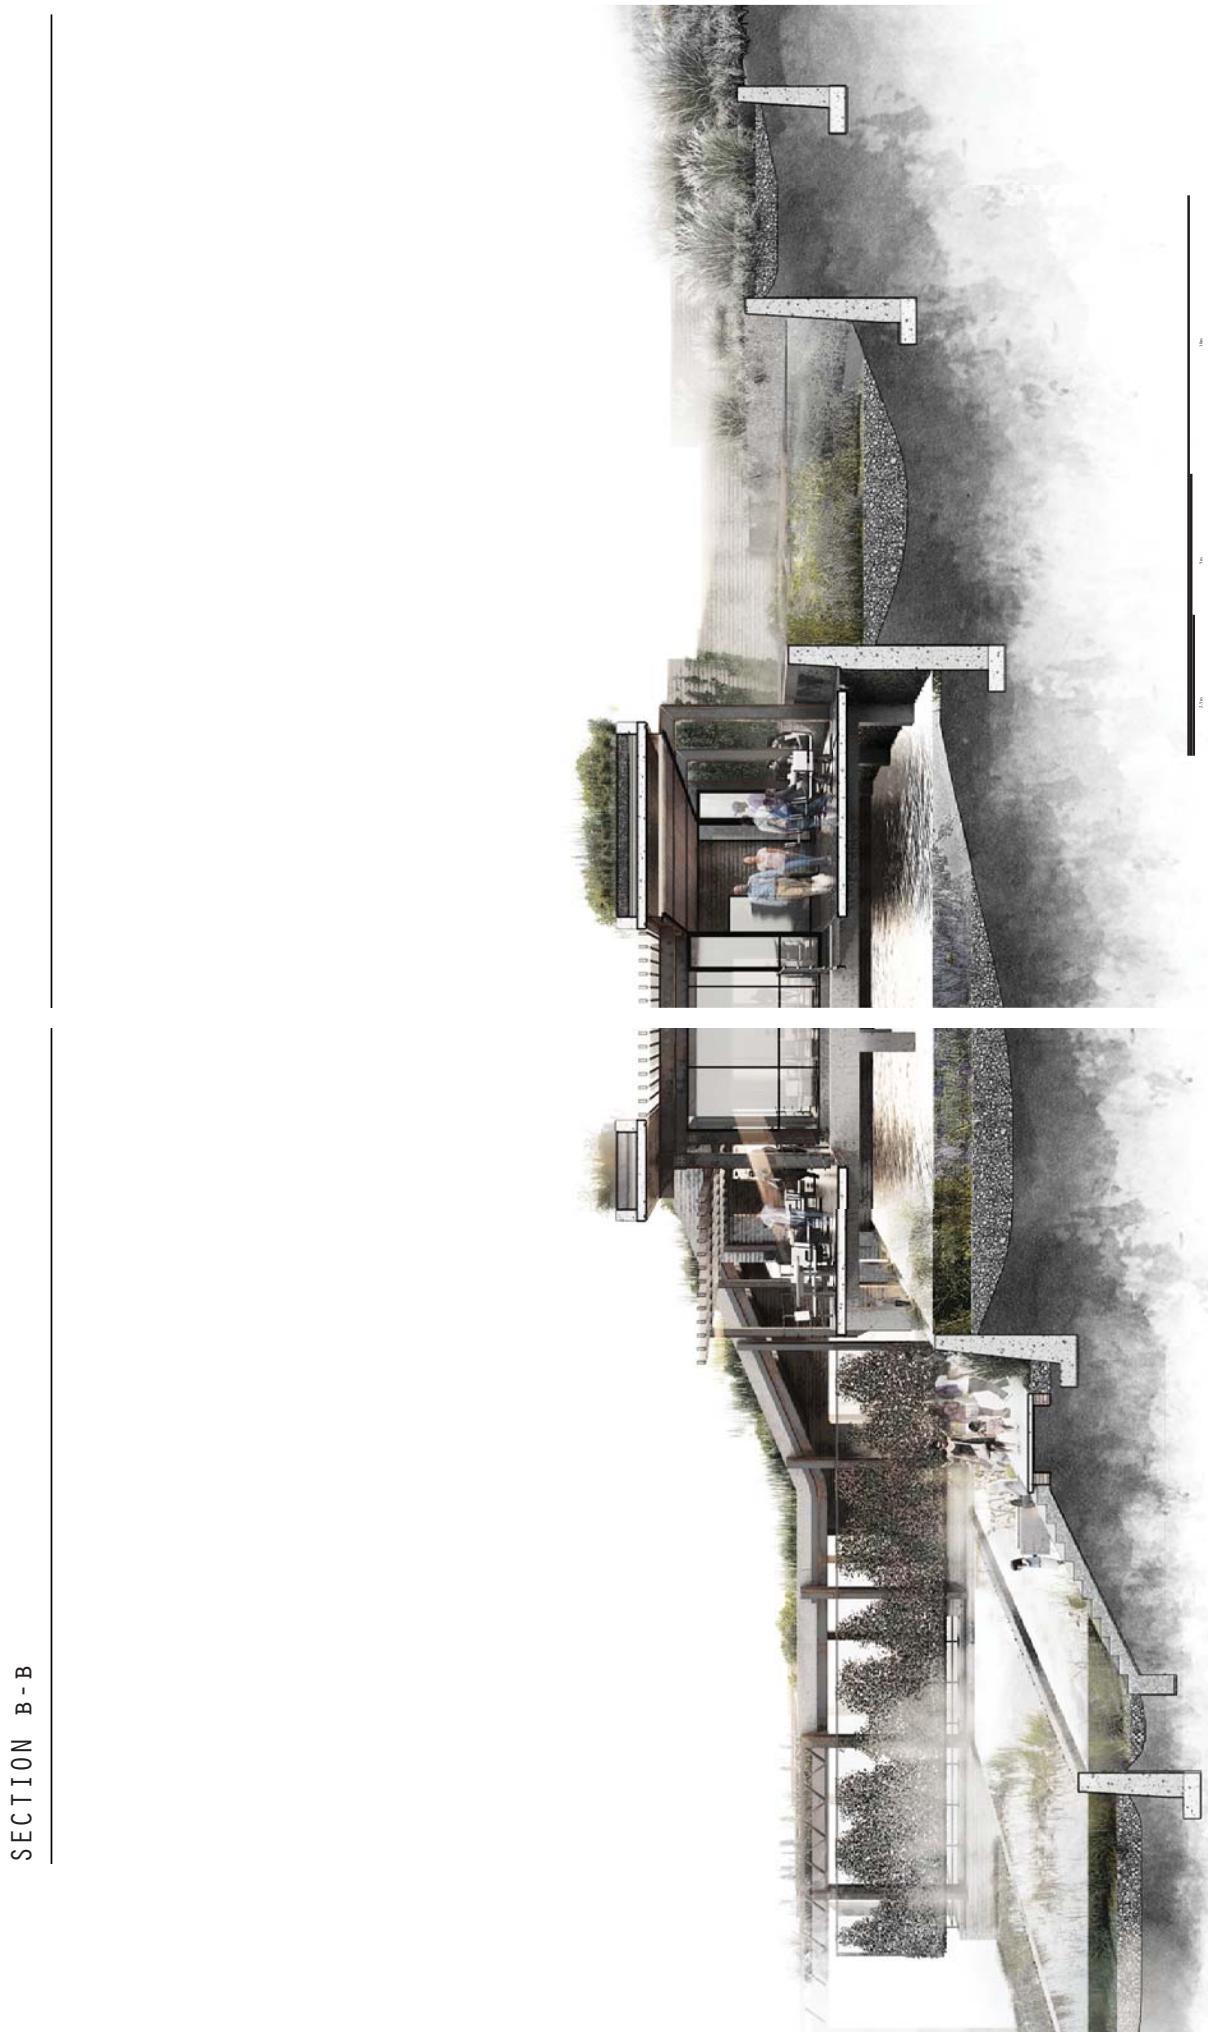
Final design section B-B drawing. (Author, 2018)
